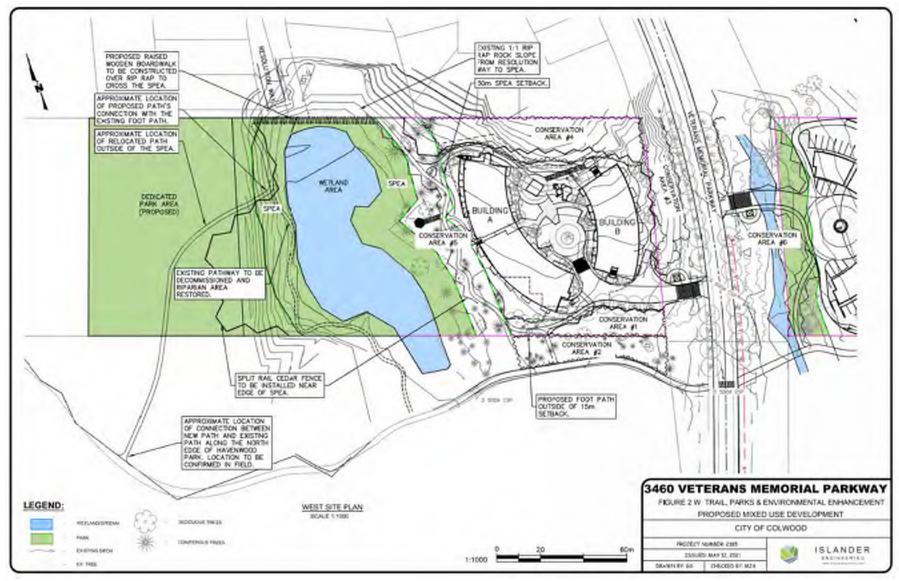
Site Plan for the proposed development - west parcel showing the proposed park dedication area as well as the proposed trail decommissioning and relocation plan.
